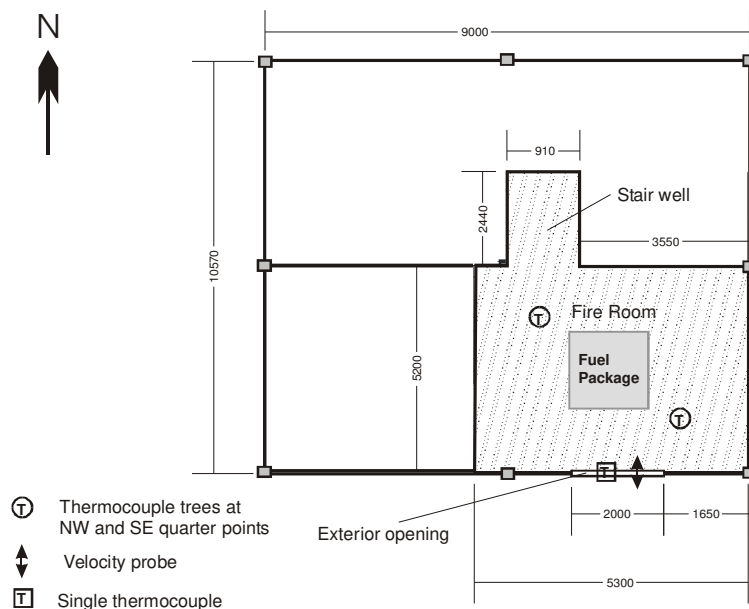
Fire room layout and instrumentation (not to scale; all dimensions in mm).
